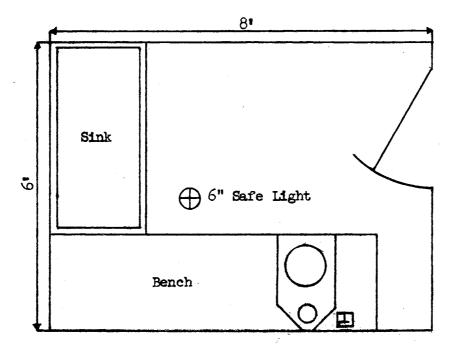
DARKROOM FLOOR PLAN GUTHRIE DAILY LEADER
